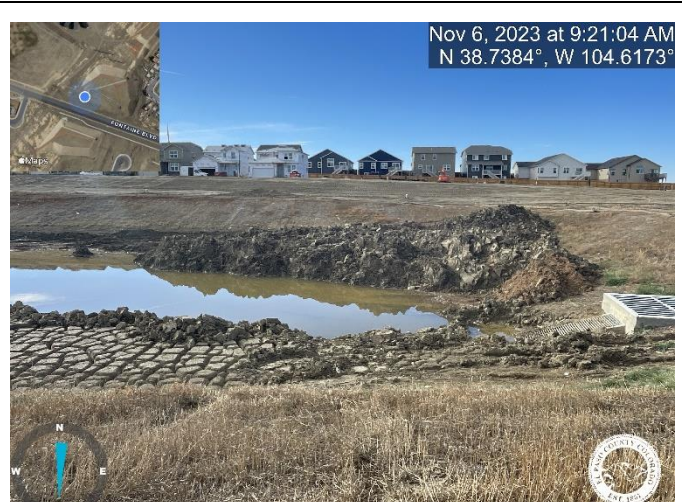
Pond C2.1: Repair crack in concrete where forebay meets the trickle channel.
